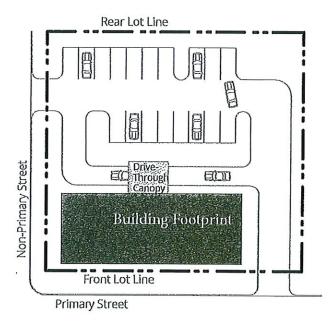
C. Example of Drive-Through Facility Layout.
